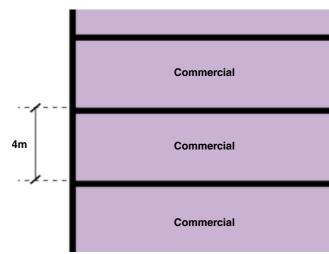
Typical commercial floor with floor to floor height of 4m
